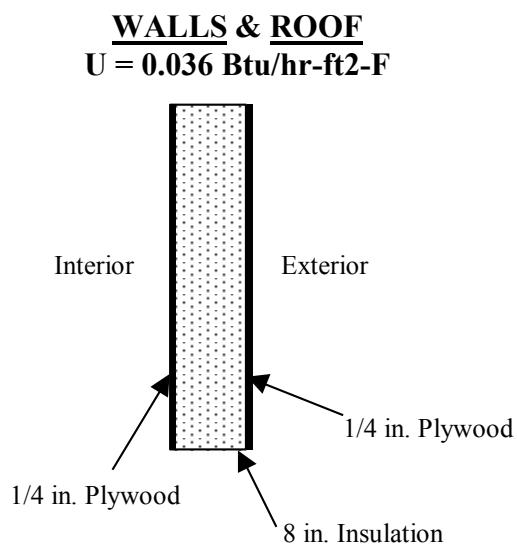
Cross-Sections of Walls and Roof: Warehouse “C”
